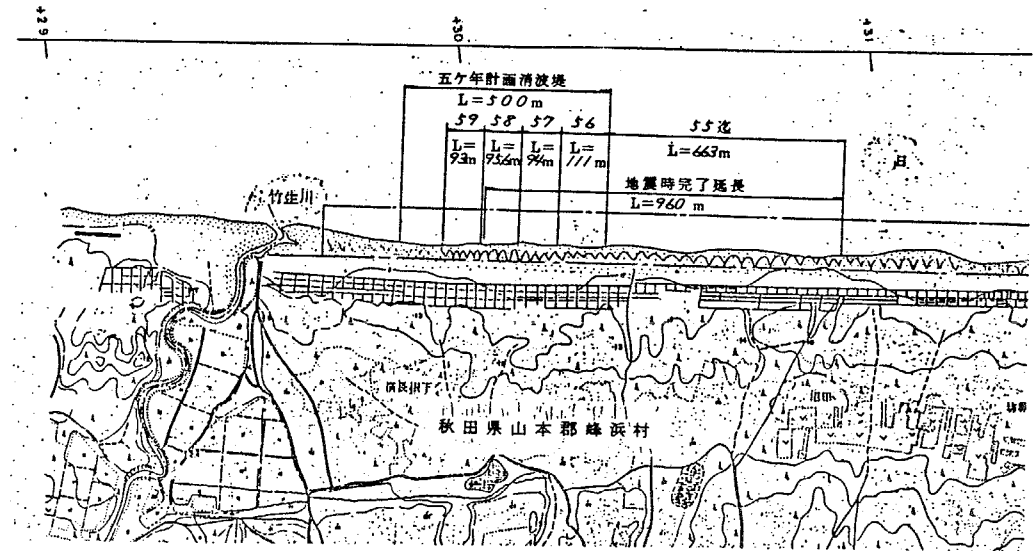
Plan of the Construction Site of the Sand Dike Protection Work of 4-tons Hexapods at Minehama.
